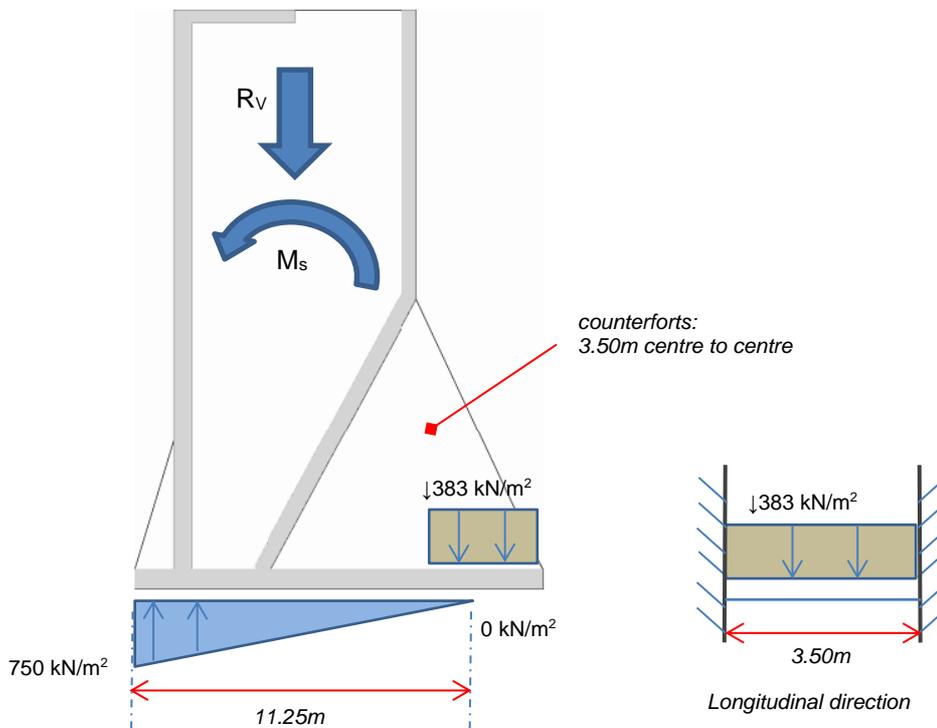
Effective pressure on caisson slab and downward soil pressure
